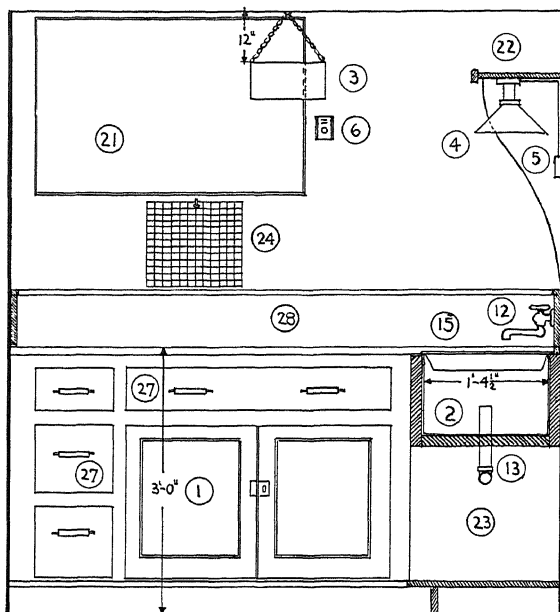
Elevation facing work bench showing enlarging table, cabinets and cross-section of sink
